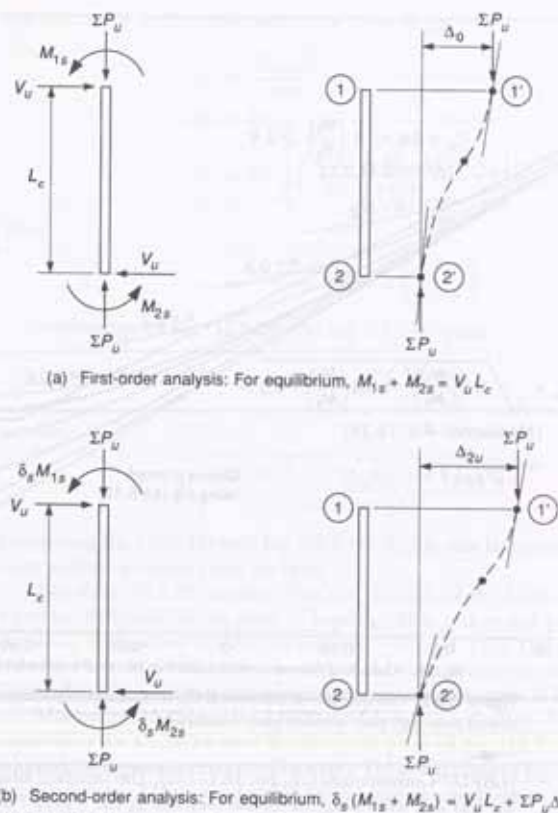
Summation of forces acting on all columns in one story of a multistory building frame.
